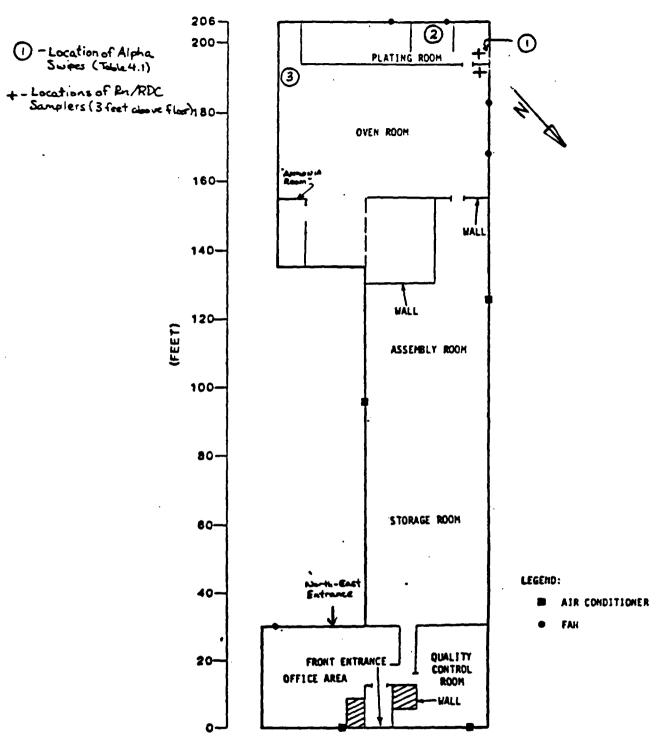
and 4.2 provide floor plans for the first and second levels of Building F, with sampling and measurement locations shown.
